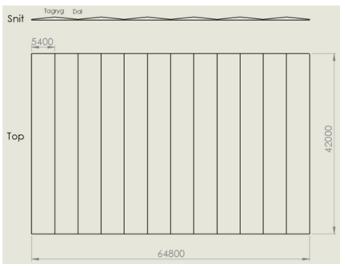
Ground plan of cover with six "roof edges" and valleys. The valleys are drainage channels. Every section of 5400 mm consist of similar elements except the edges where the upper element serves as water outlet. SPU-solution.
